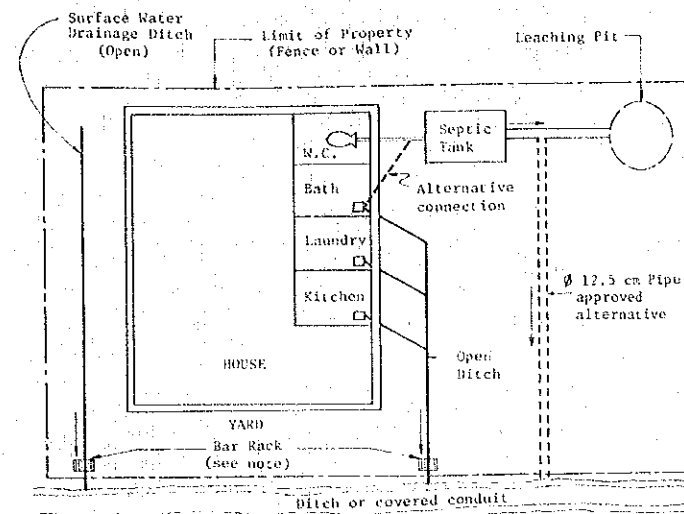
HOUSEHOLD WASTEWATER FACILITIES
